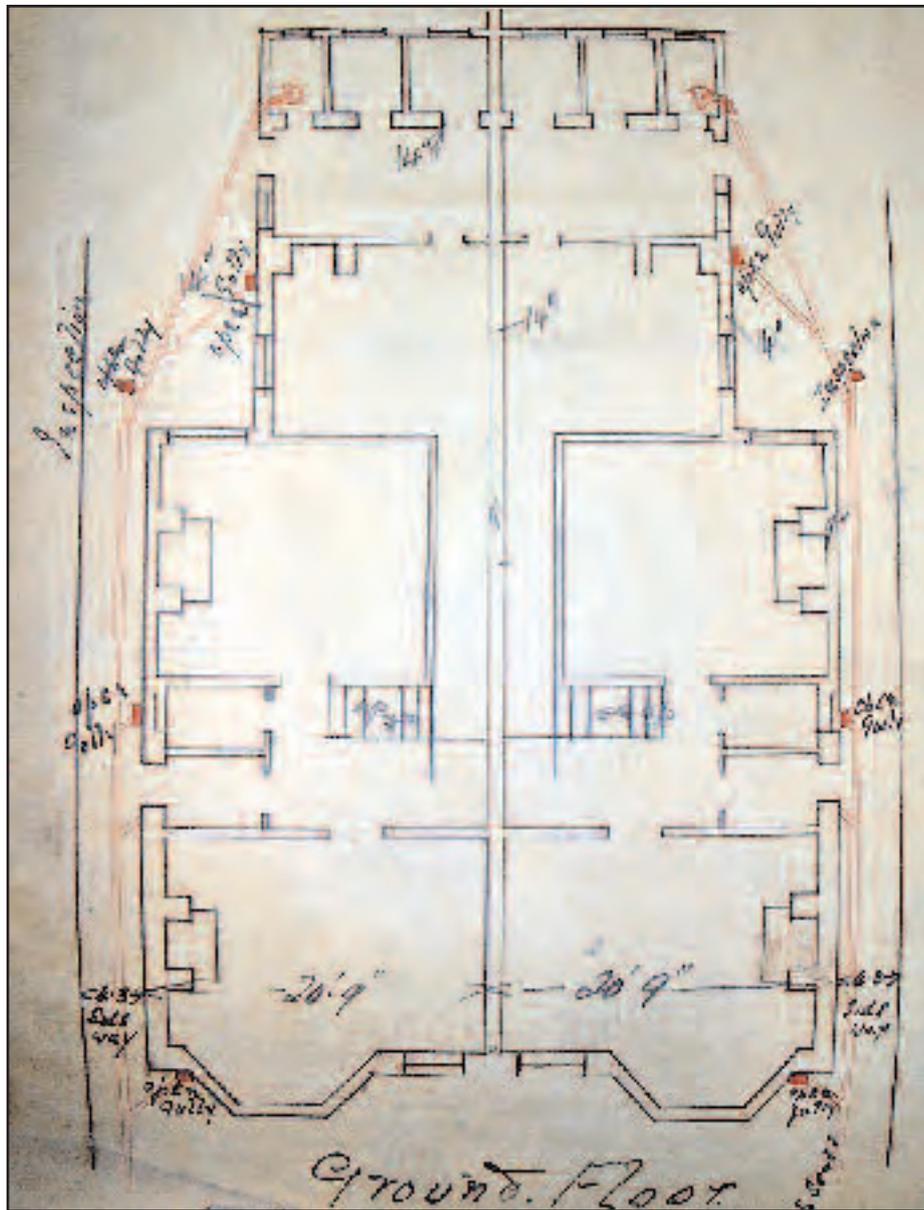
Ground floor plan, 17-27 Tyndall Avenue, 1903
